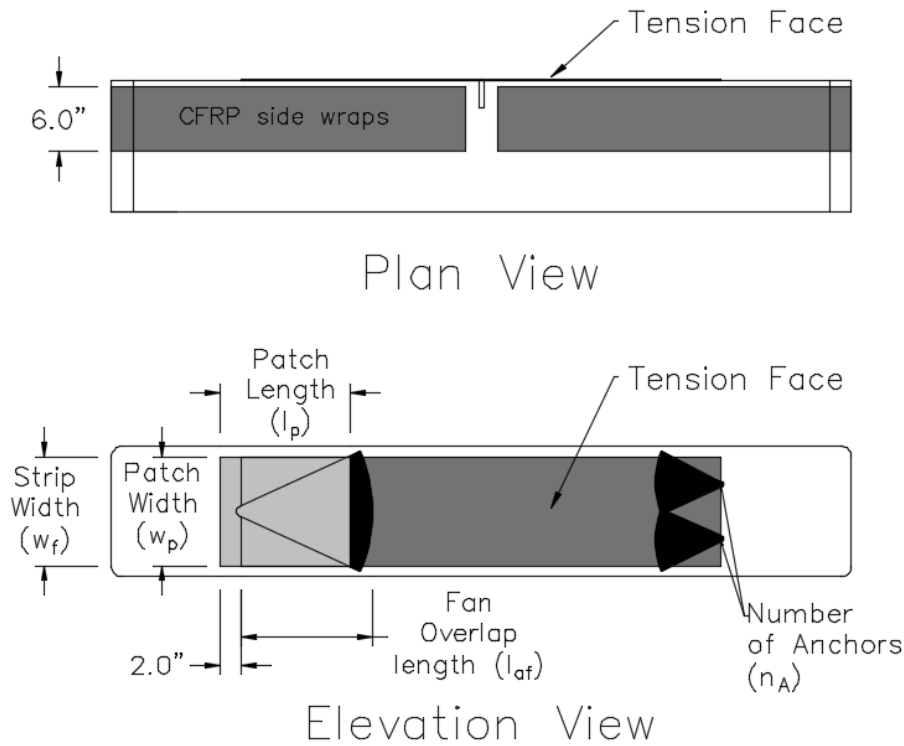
Detailed drawings of concrete specimen with CFRP
